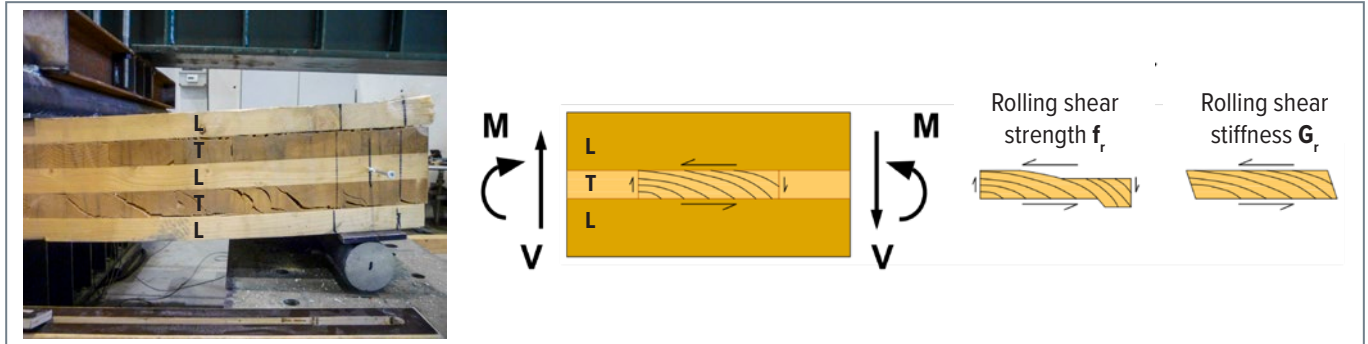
TYPICAL ROLLING SHEAR FAILURE IN CLT PANEL
